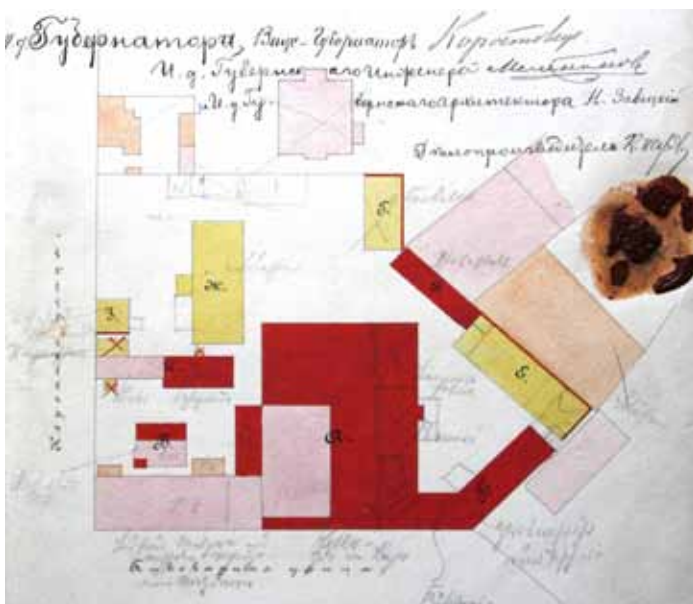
Development plan of the brewery „Ramsay & Co”, 1904 (A – extension of the ice-cellar, Б – newly erected warehouse building, В – extension of the boiler house, Г – newly erected ice-cellar, Д – newly erected horse stand, E and Ж – newly erected shed, З – newly erected apartment building for workers, И – extension of the office building). Architect P. M. Bertschy. [2]
